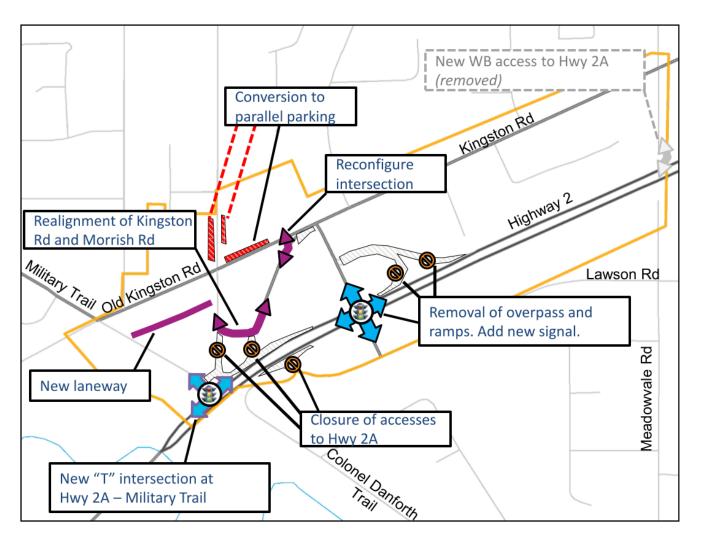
Alternative 1 – Overpass Removal and New At-Grade Intersection
